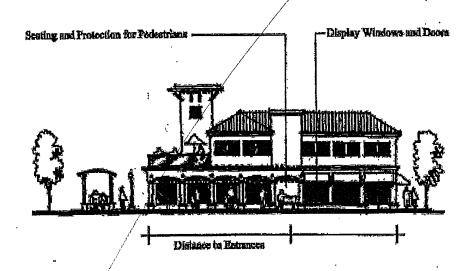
B(1) - [Douglessen / Main Street] Building Design Stements (Typical)
